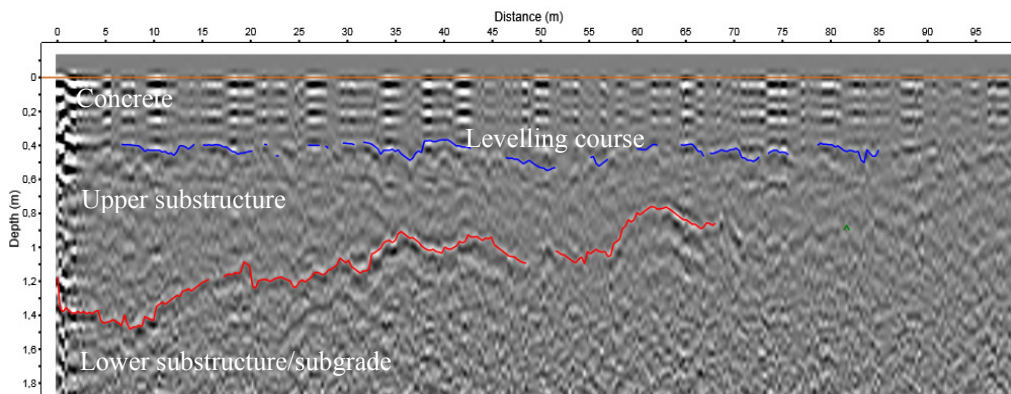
Non-reinforced concrete pavement - GPR profile (inline view)
